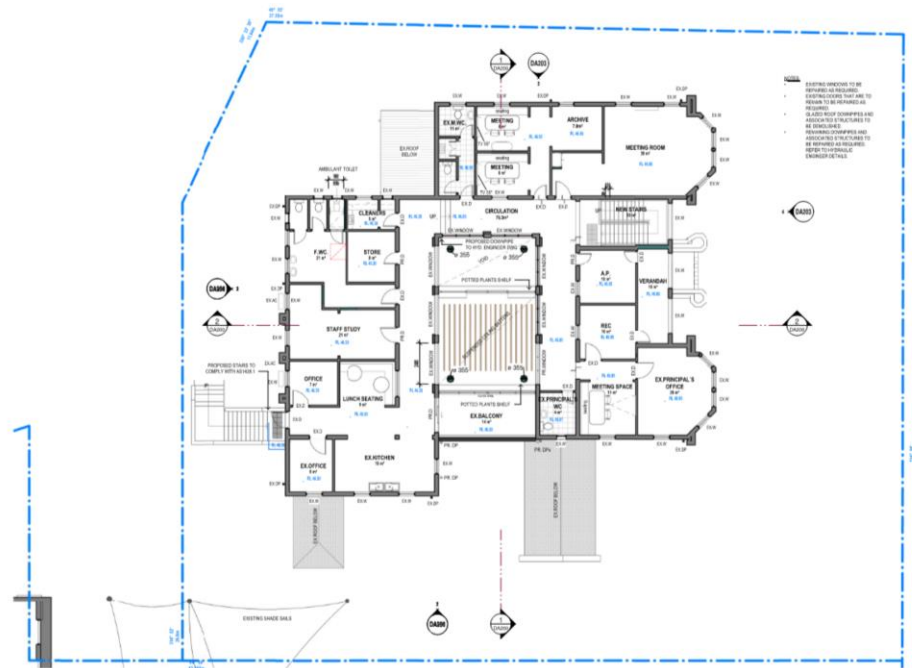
Proposed first floor plan (Source: Leaf Architecture)
